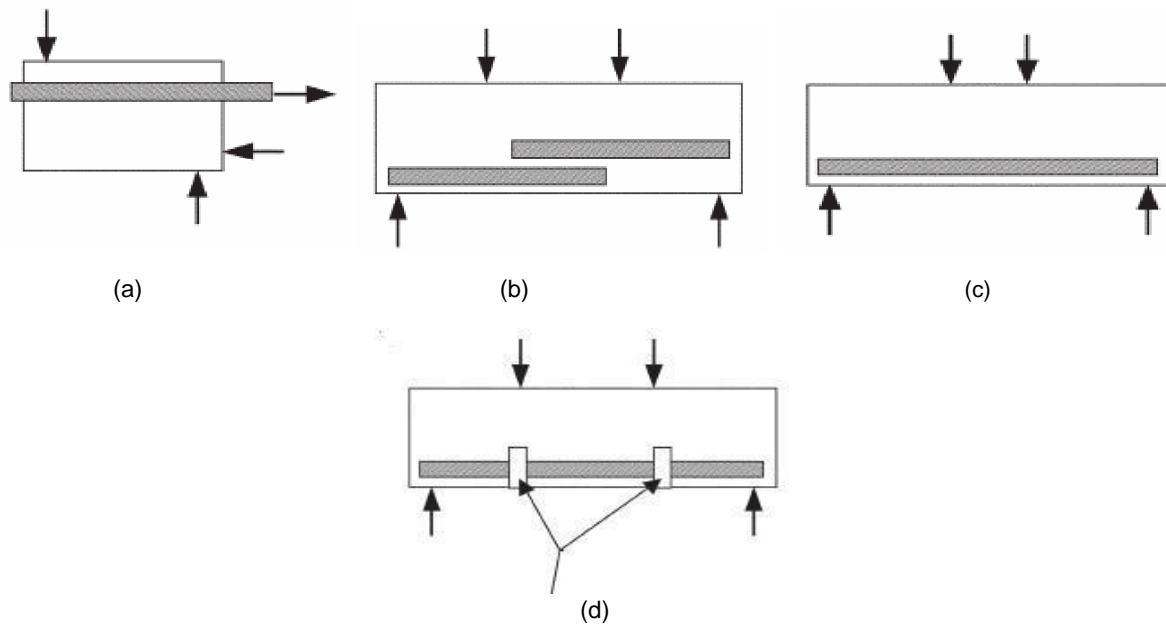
Types of beam test methods: (a) beam-end specimen; (b) simple beam specimen; (c) splice specimen; (d) notched beam specimen.
